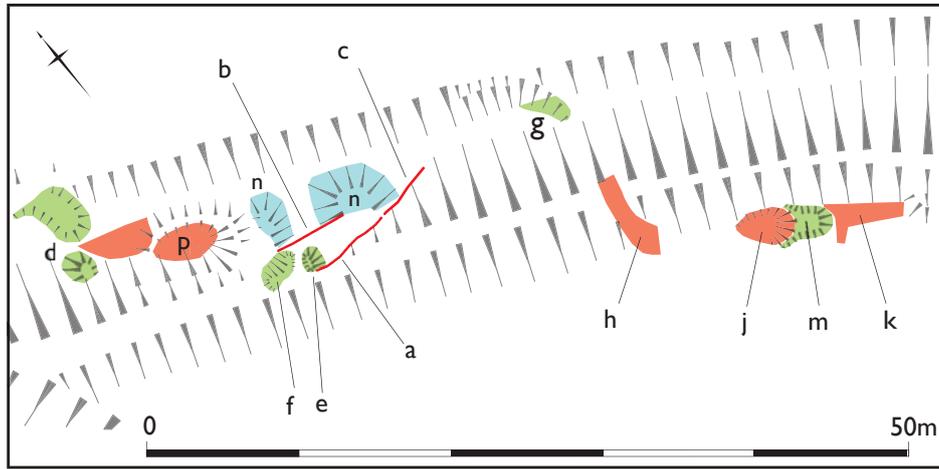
Enlarged plan of middle rampart showing damaged earthworks and outline instructions for repair.
